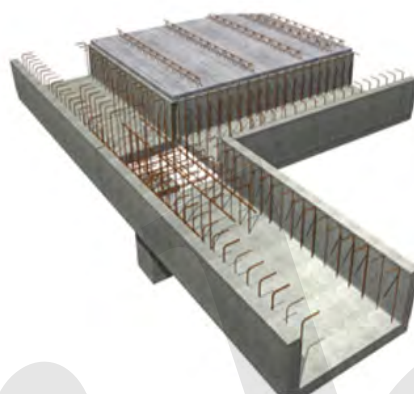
Filigree slab and beam solution in heavy load transfer area.
